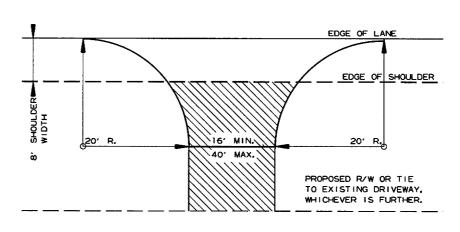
DETAIL FOR COUNTY ROAD TURNOUTS OPEN SHOULDER SECTION
